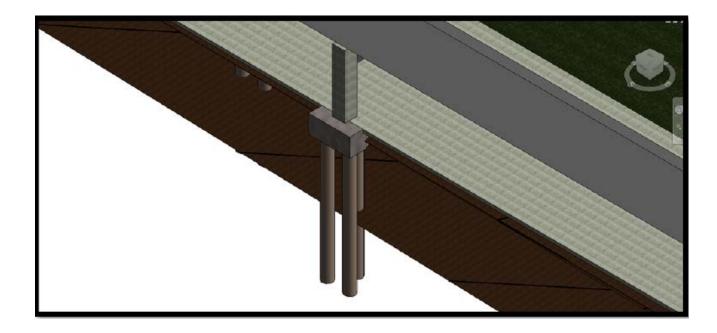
3D model of piled deep foundation (Alvarez & Gomez 2013)
